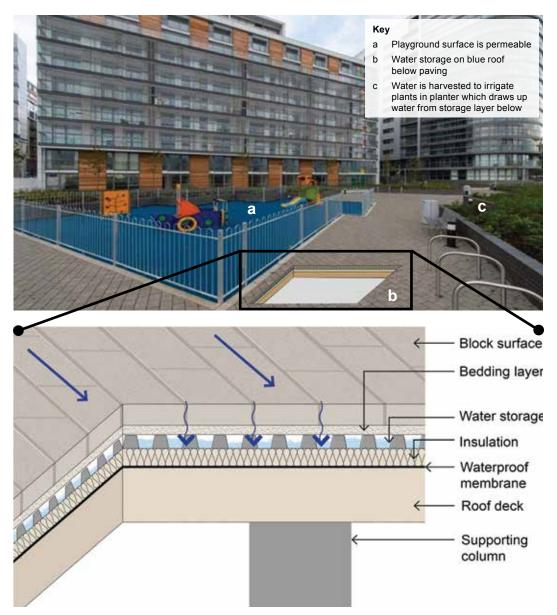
Blue roof, with cut-away showing the layering of the blue roof design
